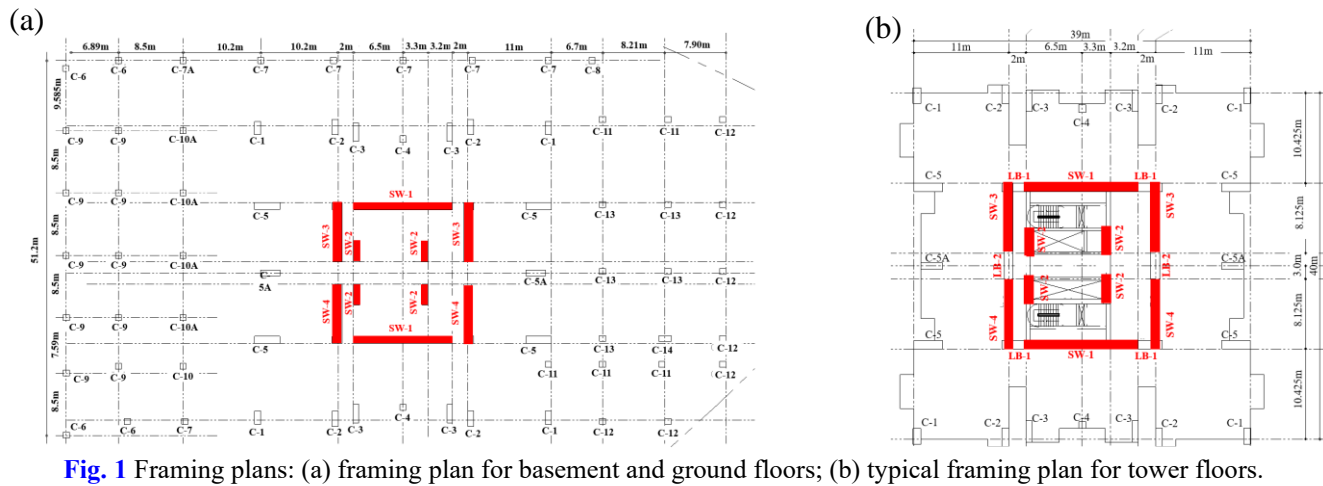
Framing plans: (a) framing plan for basement and ground floors; (b) typical framing plan for tower floors.
